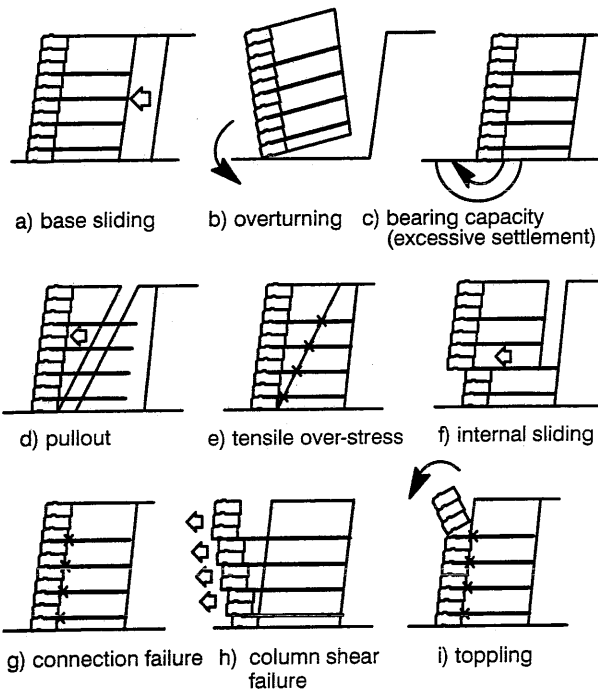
Modes of failure: external (top row); internal (middle row); facing (bottom row) (adapted from Simac et al. 1993).
